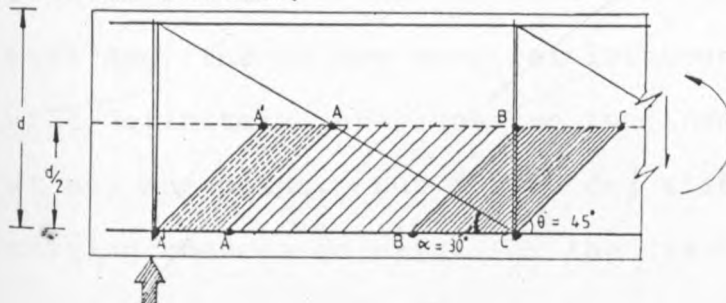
ARRANGEMENT OF SHEAR REINFORCEMENT
